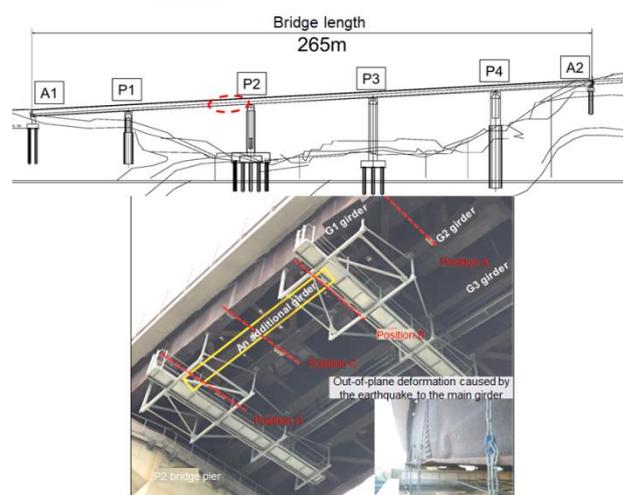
Additional girder installed in restoration of the Okirihata Bridge
